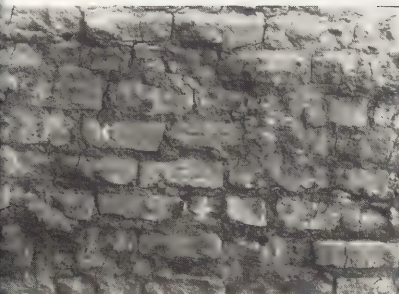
Detail of the wall excavated during the conservation intervention. The structure has maintained its original texture and consistency.
